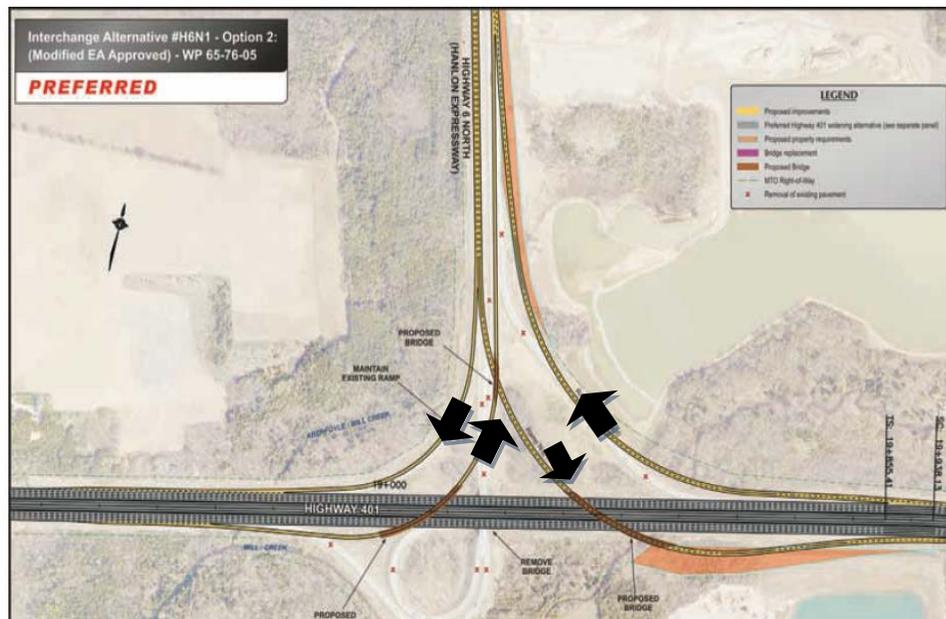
Highway 6 Bypass Connection with Highway 6 North
